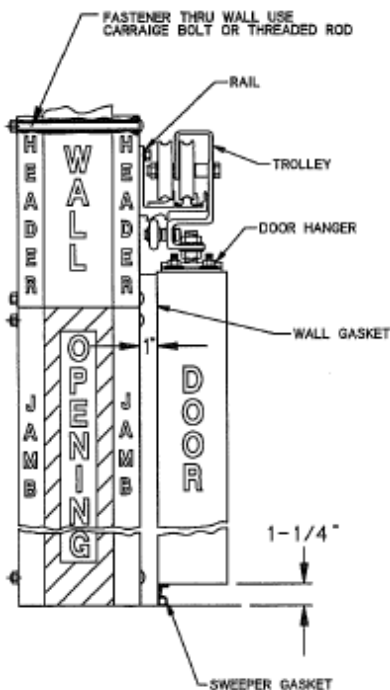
B shows a side view of a completed bi-parting door installation in the closed door position. The door stops are not shown.
